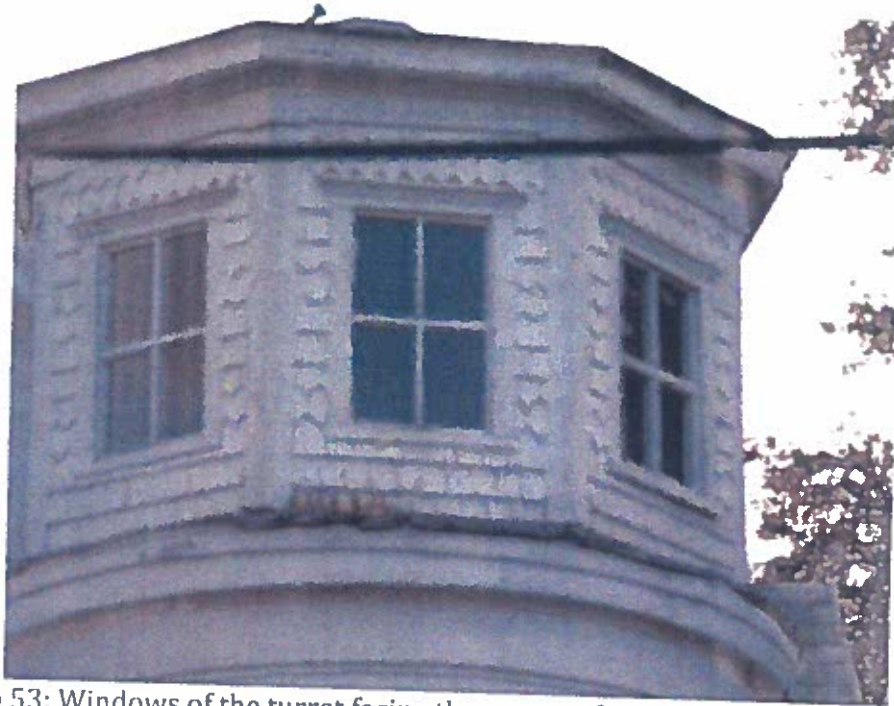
Windows of the turret facing the corner of Market Street and 4<sup>th</sup> Street (northeast corner of house). These window open to the attic and are not operational.
